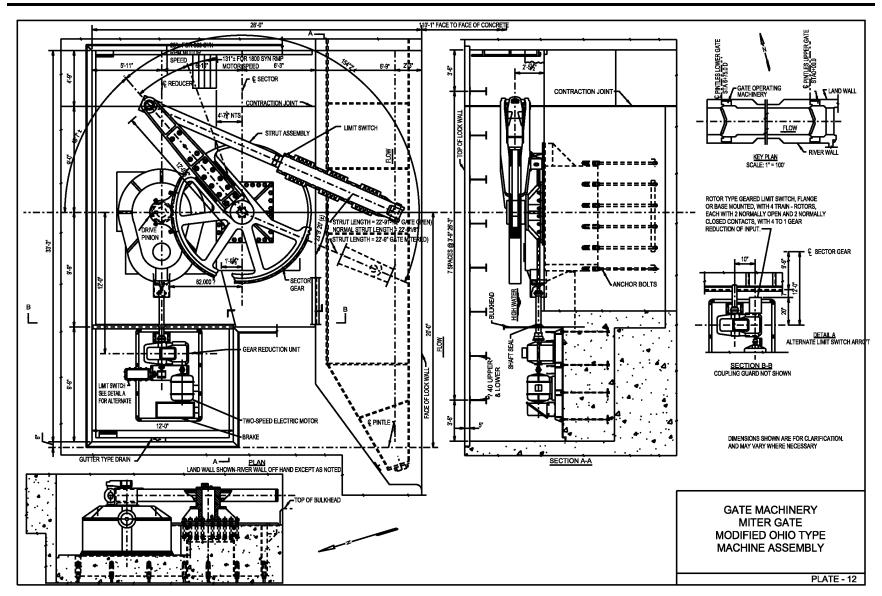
Plate 12: Gate machinery miter gate, modified Ohio type machine assembly
